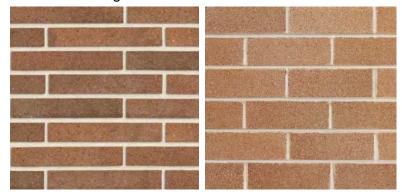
previously proposed brickwork (left) – proposed brickwork (right)
